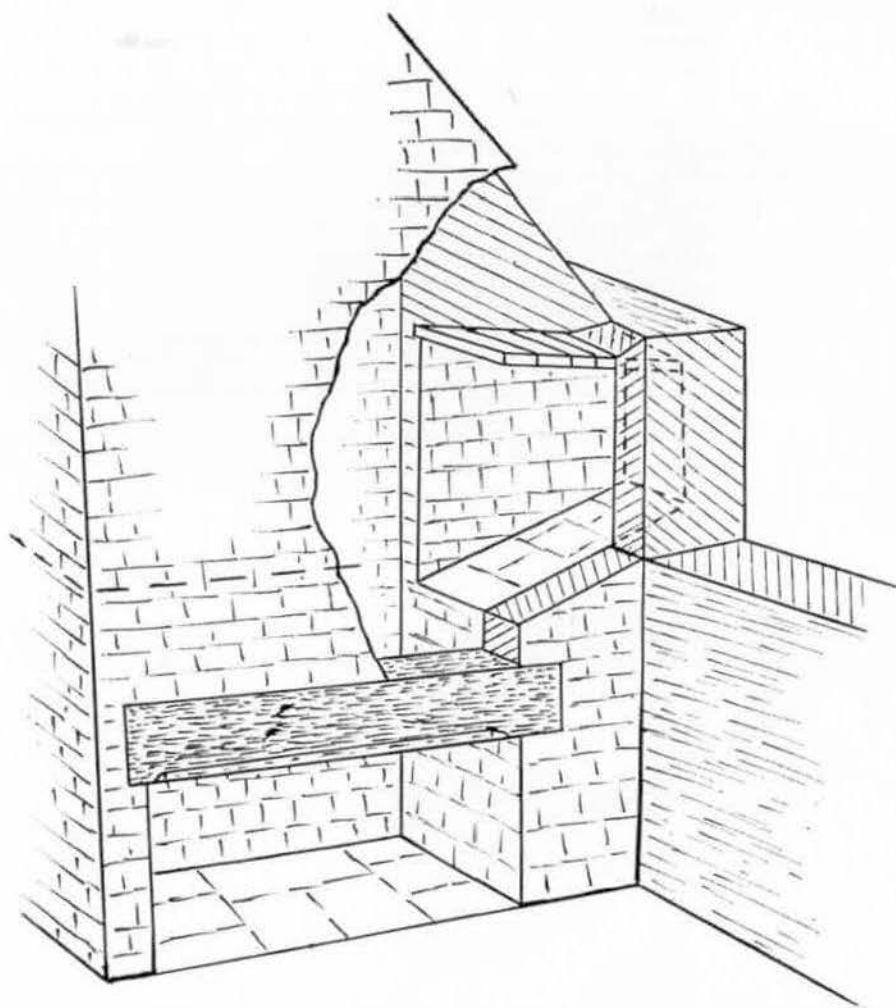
Cutaway perspective view of the smoking recess in the hall stack at Durrett's Farmhouse, Broomfield.
